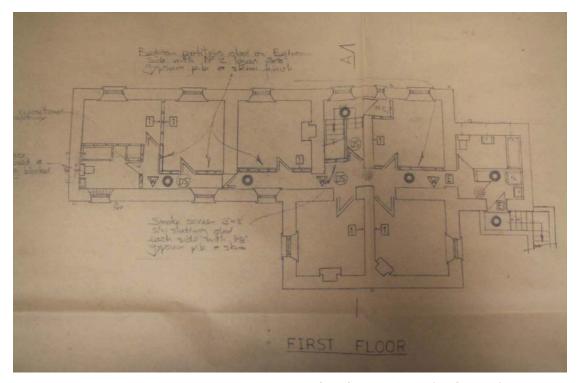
Proposed alterations to the first floor in 1986 (Ref. 0567)
